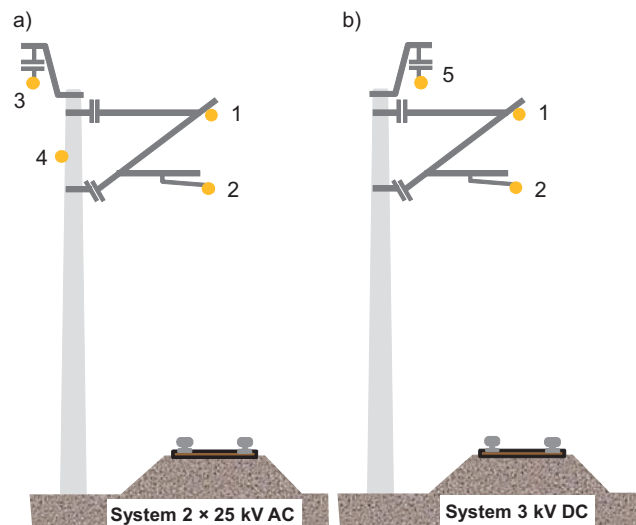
Example of arrangement of the overhead contact line elements on a pole [8]: (a) 2×25 kV system; (b) 3 kV DC system; 1 – messenger wire, 2 – contact wire, 3 – feeder, 4 – protection wire, 5 – group protection wire
